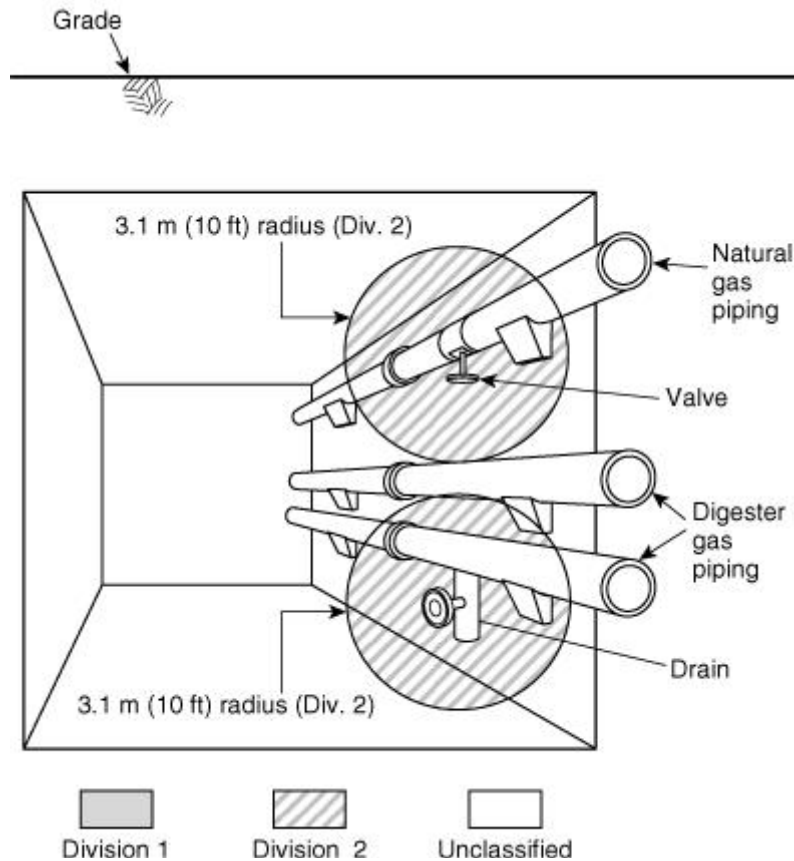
(g) Underground Tunnel Containing Natural Gas or Sludge Gas Piping and Using Ventilation Method (C); Illustration of Table 6.2(a), Rows 20c and 20d.
